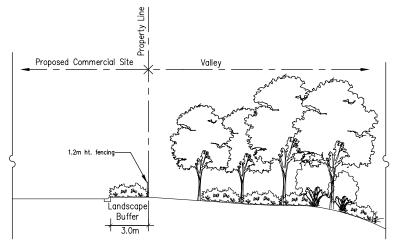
Commercial / Open Space interface - Typical section
